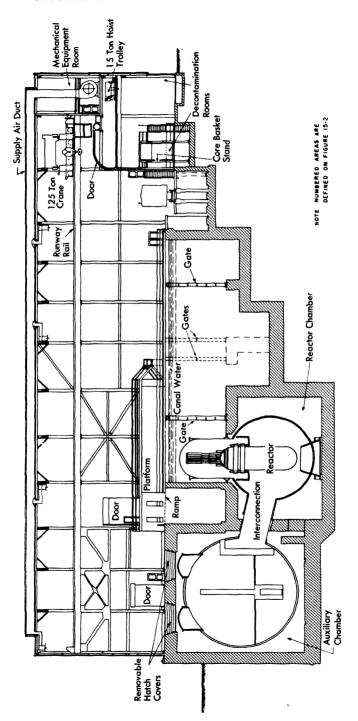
Elevation of reactor plant and fuel-handling facilities.
